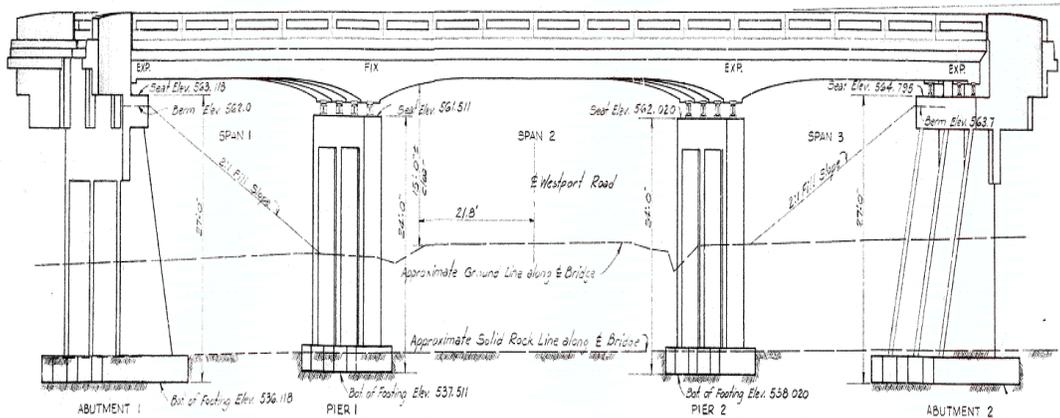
A typical spill-through abutment (bridge No. 056B00489N)
